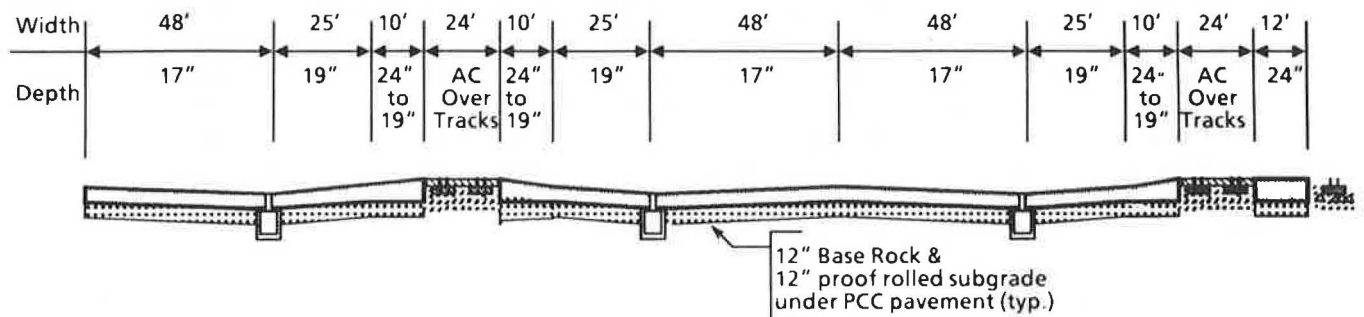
Cross section through width of PCC pavement (not to scale).
